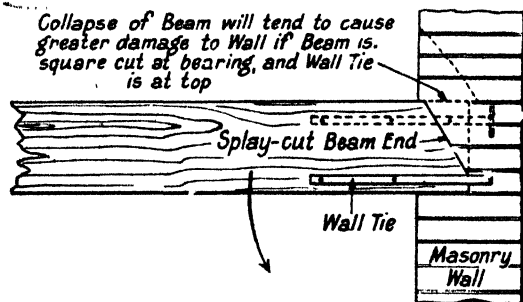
WALL BEARINGS OF TIMBER BEAMS
